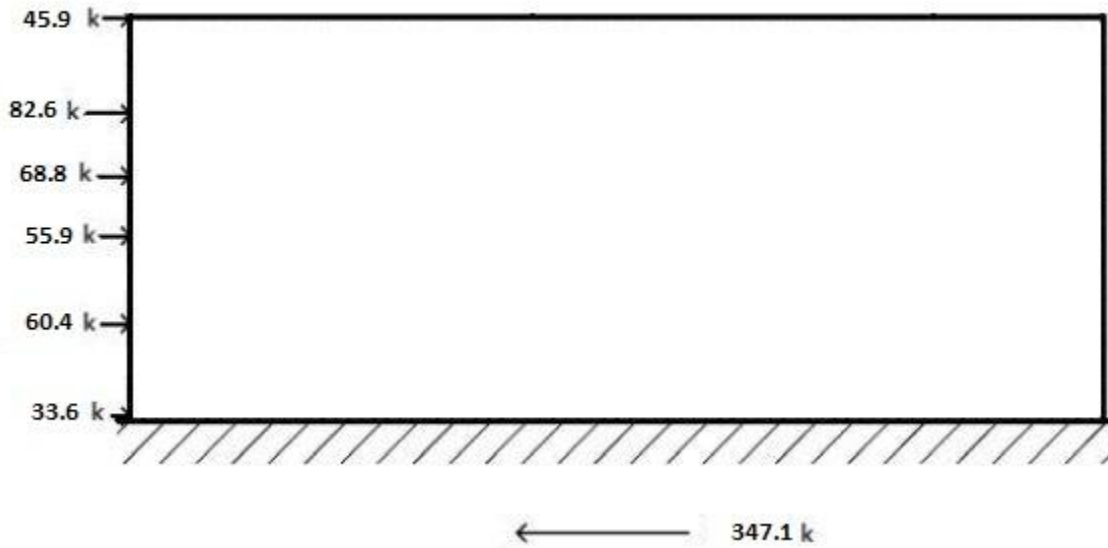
Wind Forces acting at each floor level on the East Wing, East and West facades
